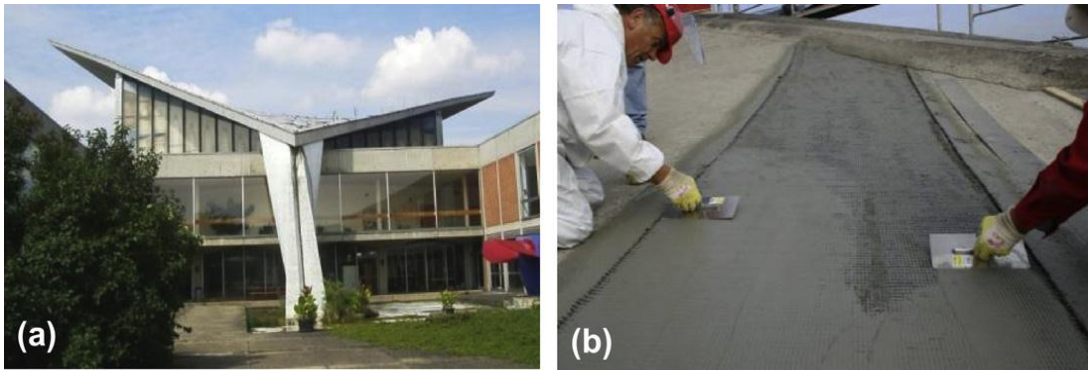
a) Steel reinforced concrete hyper-shell at the FH Schweinfurt (Germany), b) Embedding the textile reinforcement [56].
